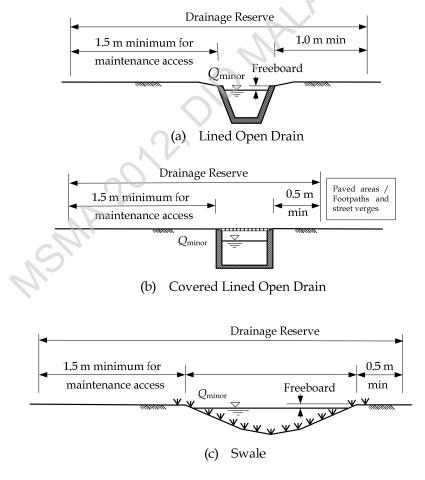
Drainage Reserve for Minor Drain and Swale
